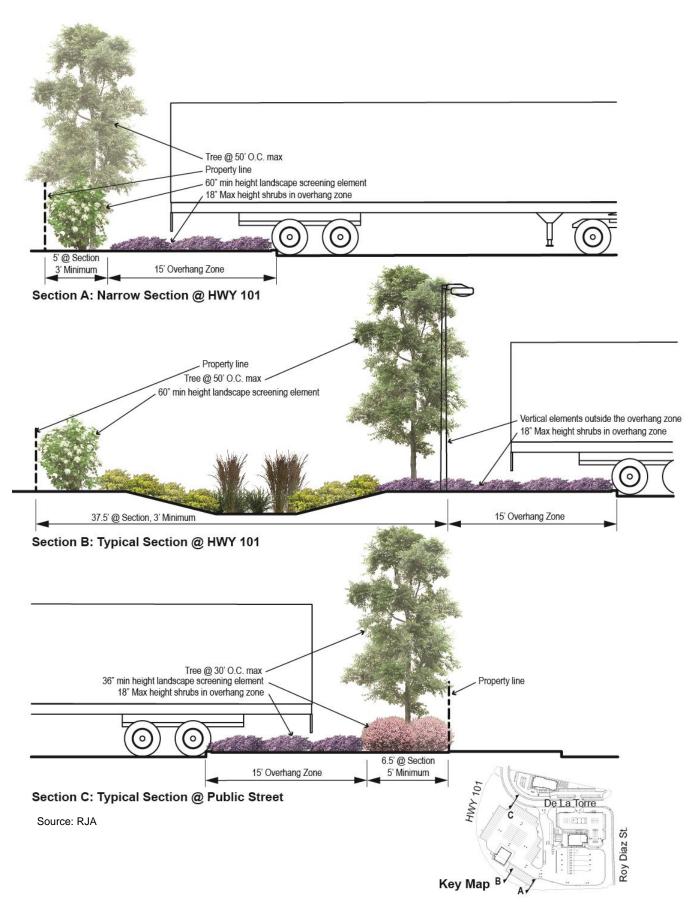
Development Area 2 Truck Parking Lot Sections
